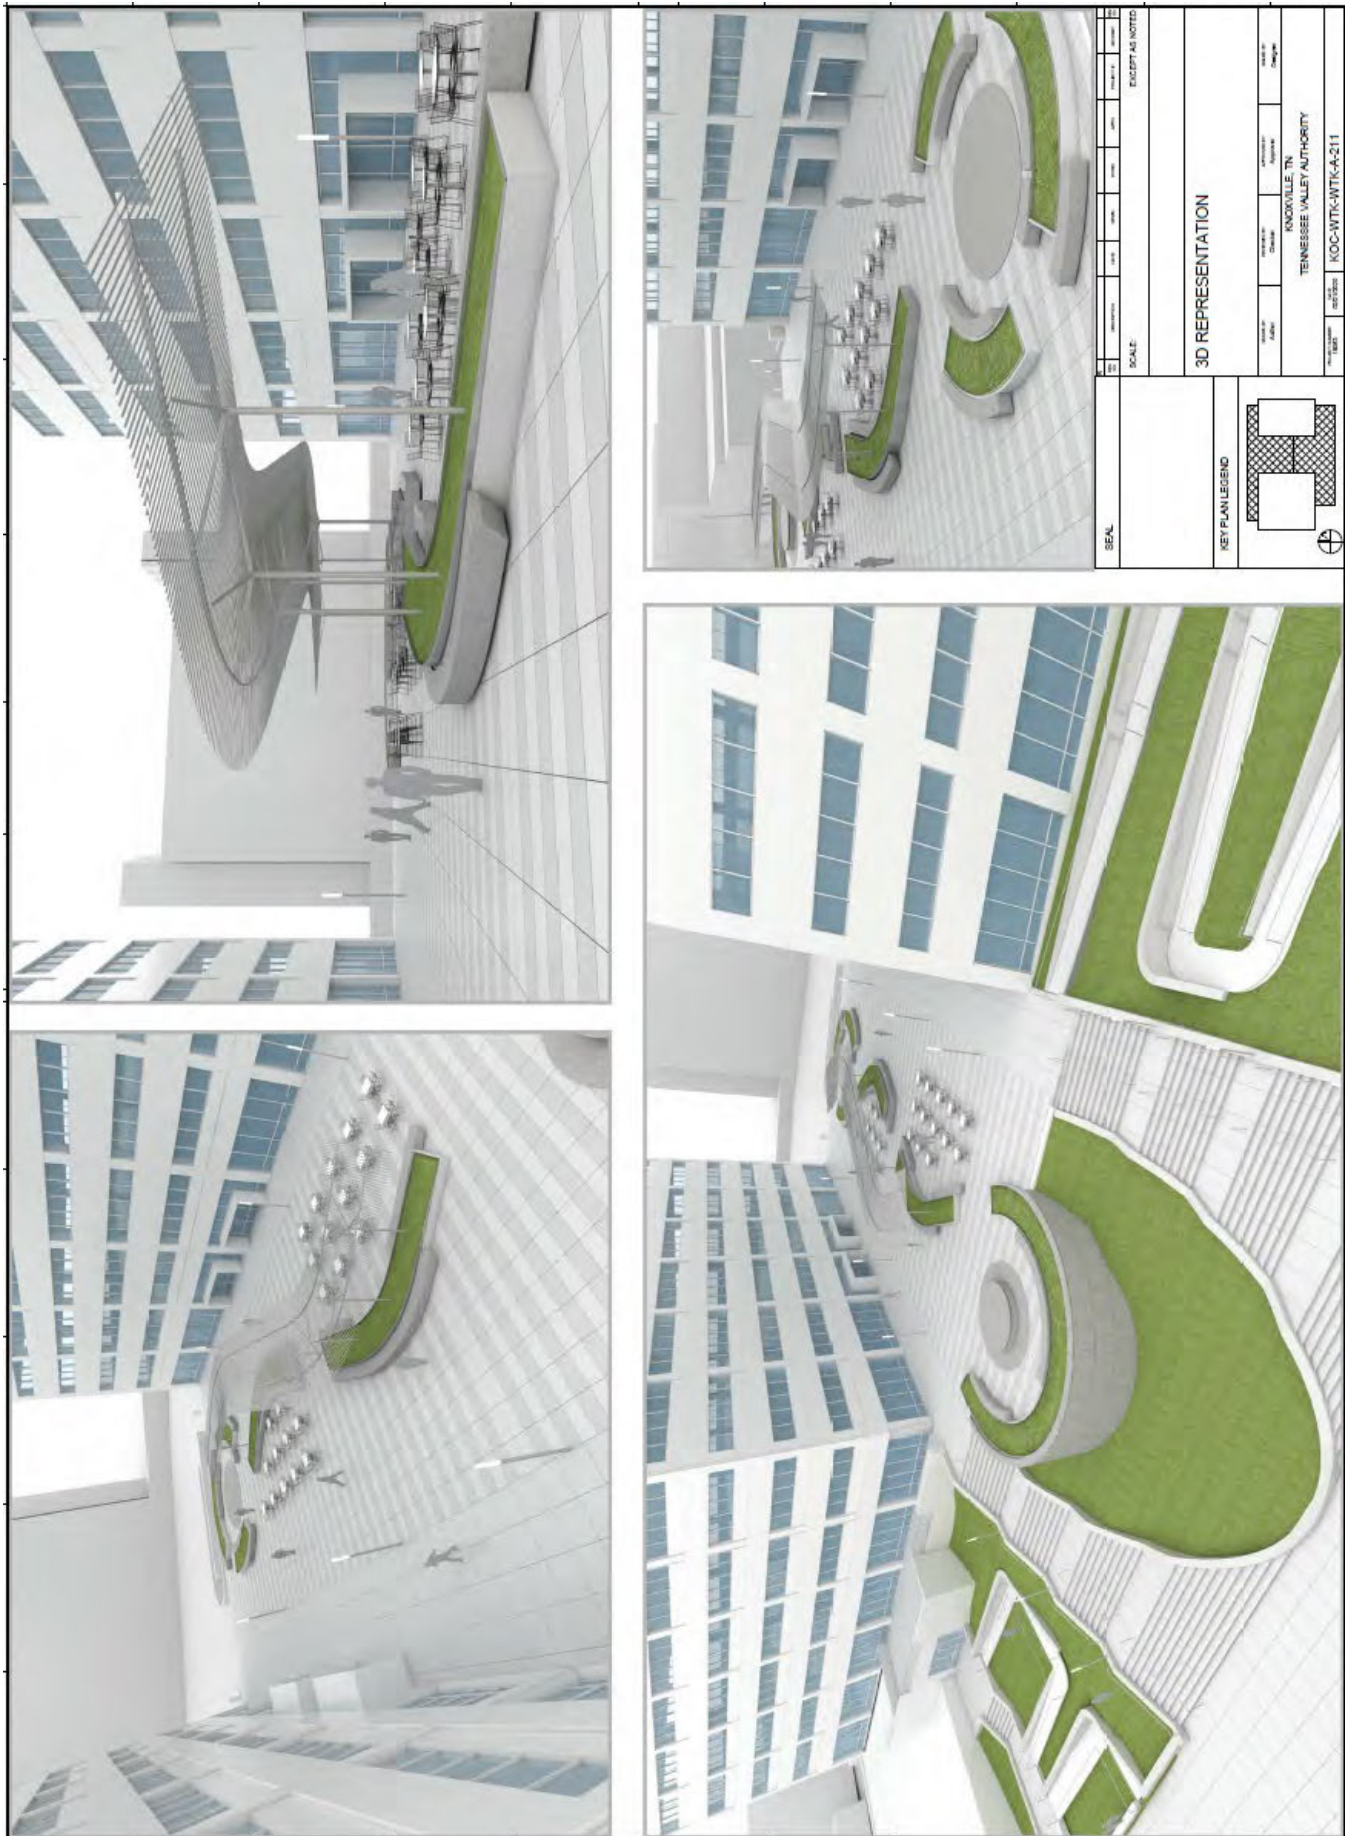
3D Representation of Proposed Plaza, site plan of KOC Plaza.
